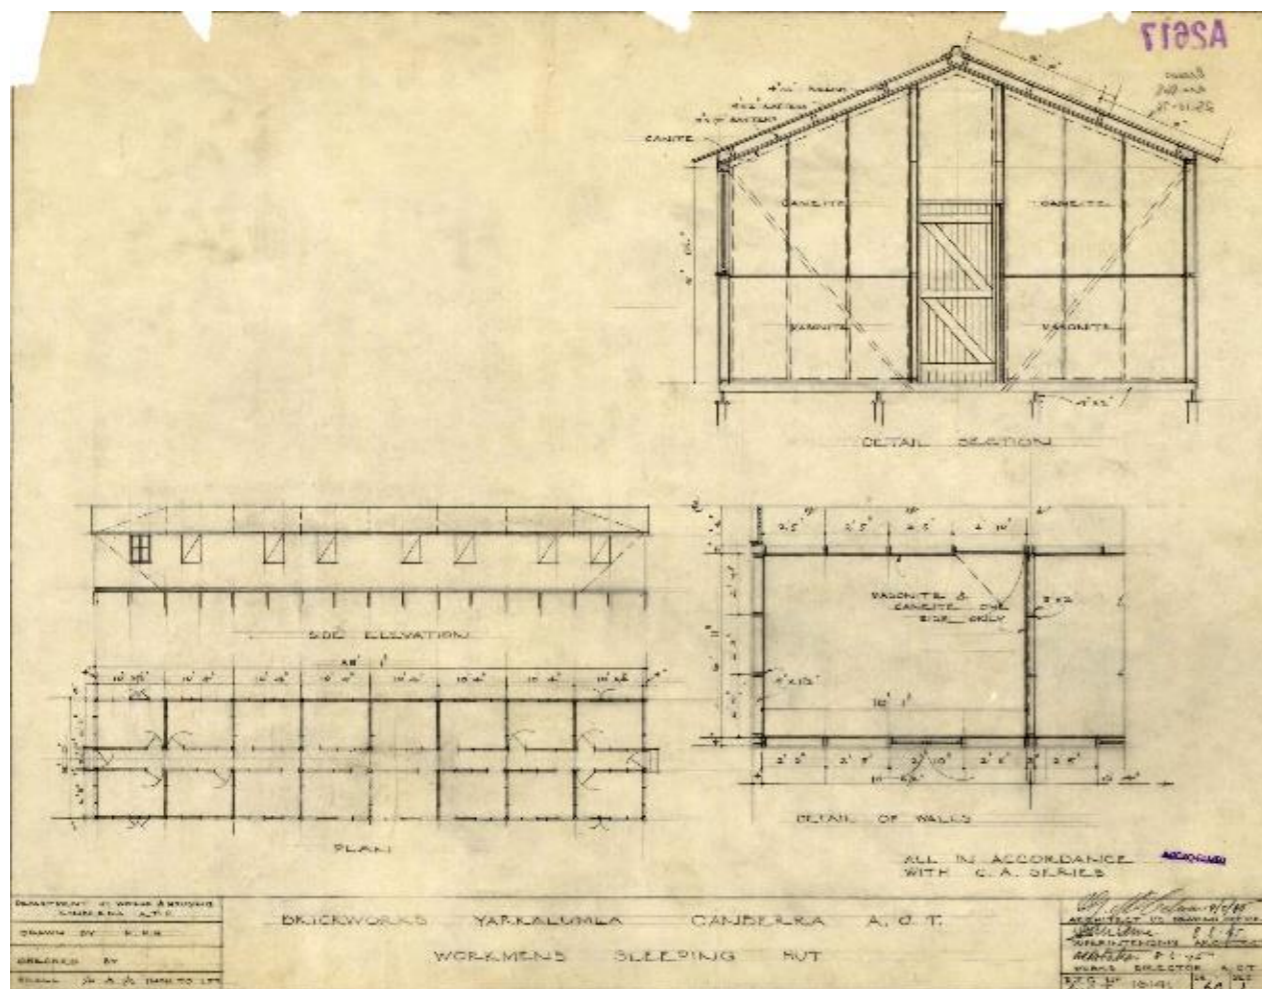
'Workmen's Sleeping Hut'. (Source: NAA A2617, Section 75/16141)
